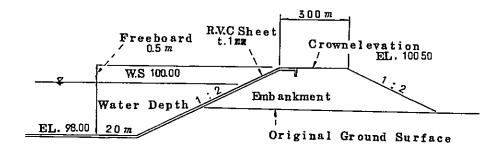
Cross Section of Farm Pond Embankment
